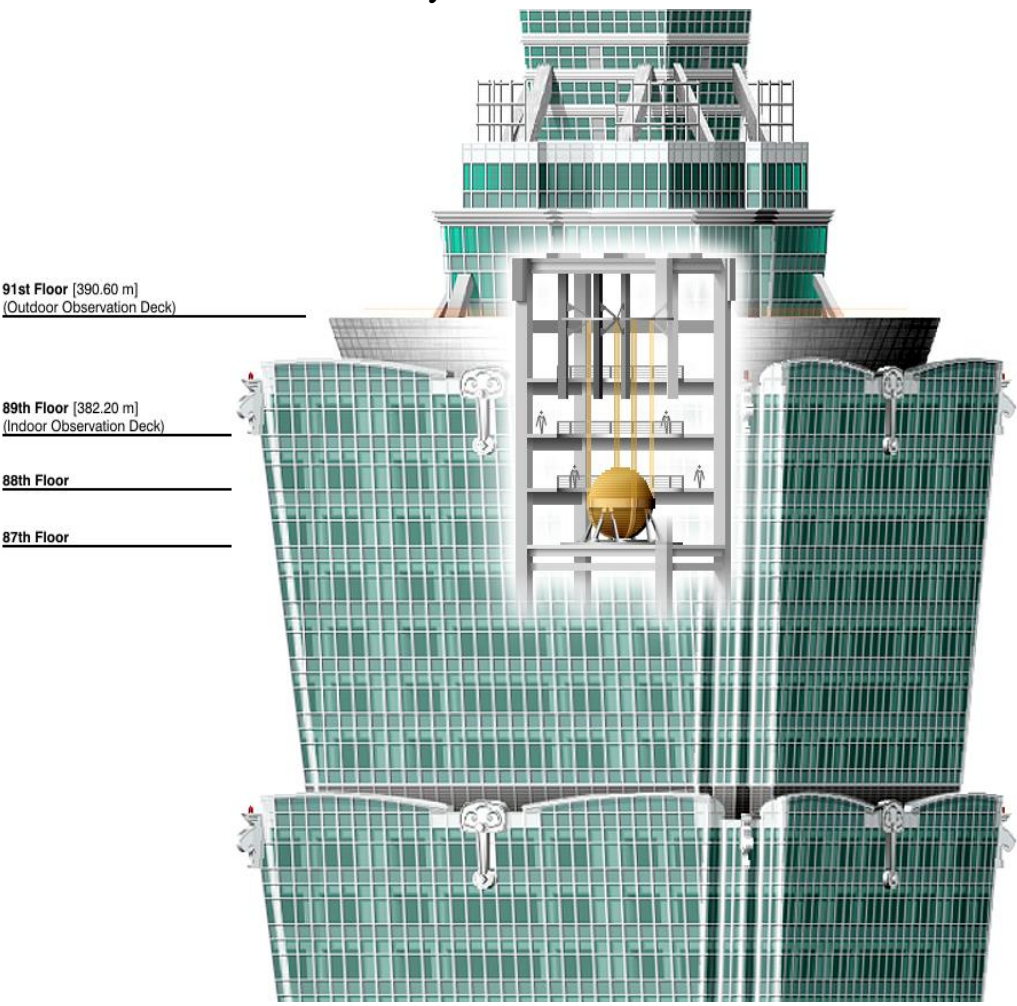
Inertia damper in Taipei 101 building, Taipei City
